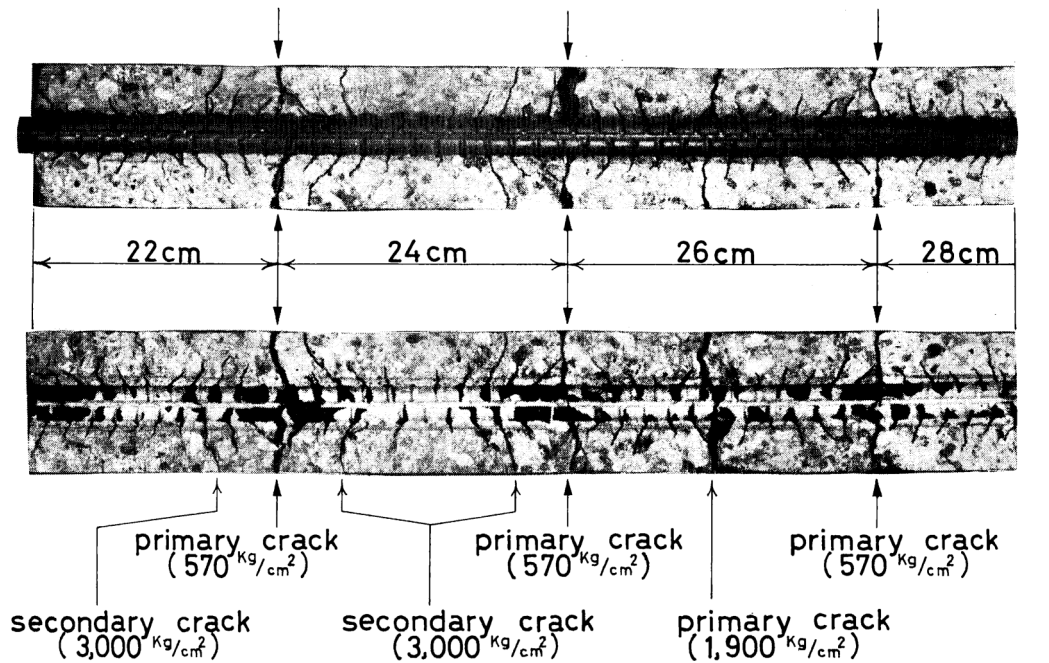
Internal cracks with (32 mm) bar (Goto, 1971)
